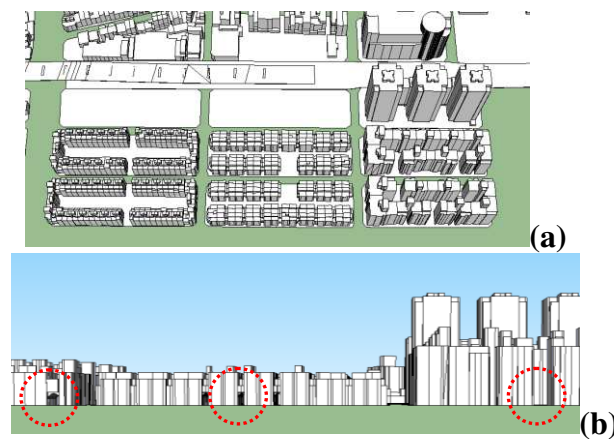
Community residential building plan 2 (slightly-adjusted situation). (a) Perspective view. (b) The south elevation view
